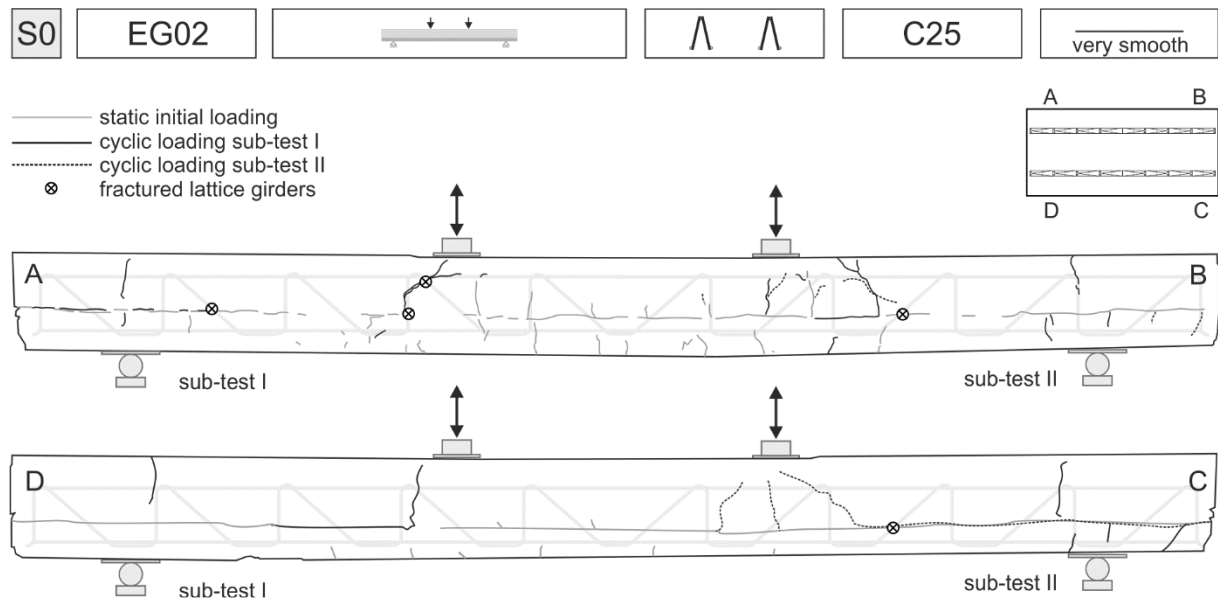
Test parameters, crack patterns and lattice girder fractures of specimen EG02
